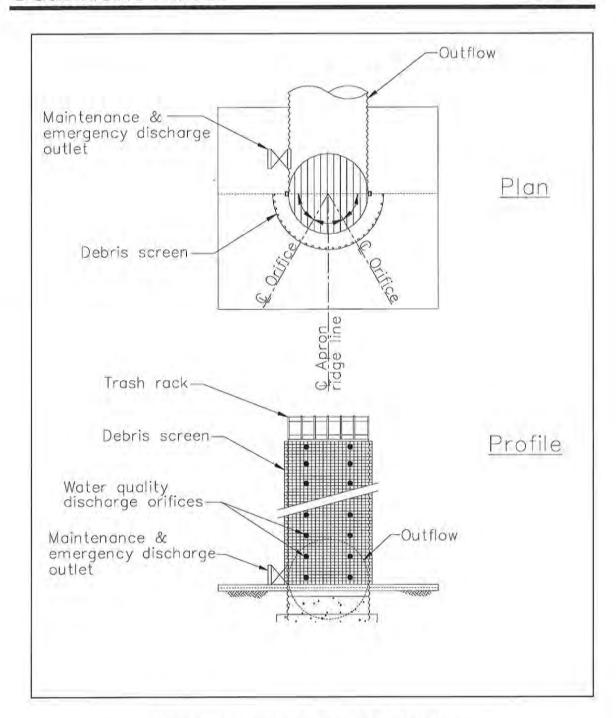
MULTIPLE ORIFICE OUTLET RISER NOT TO SCALE
